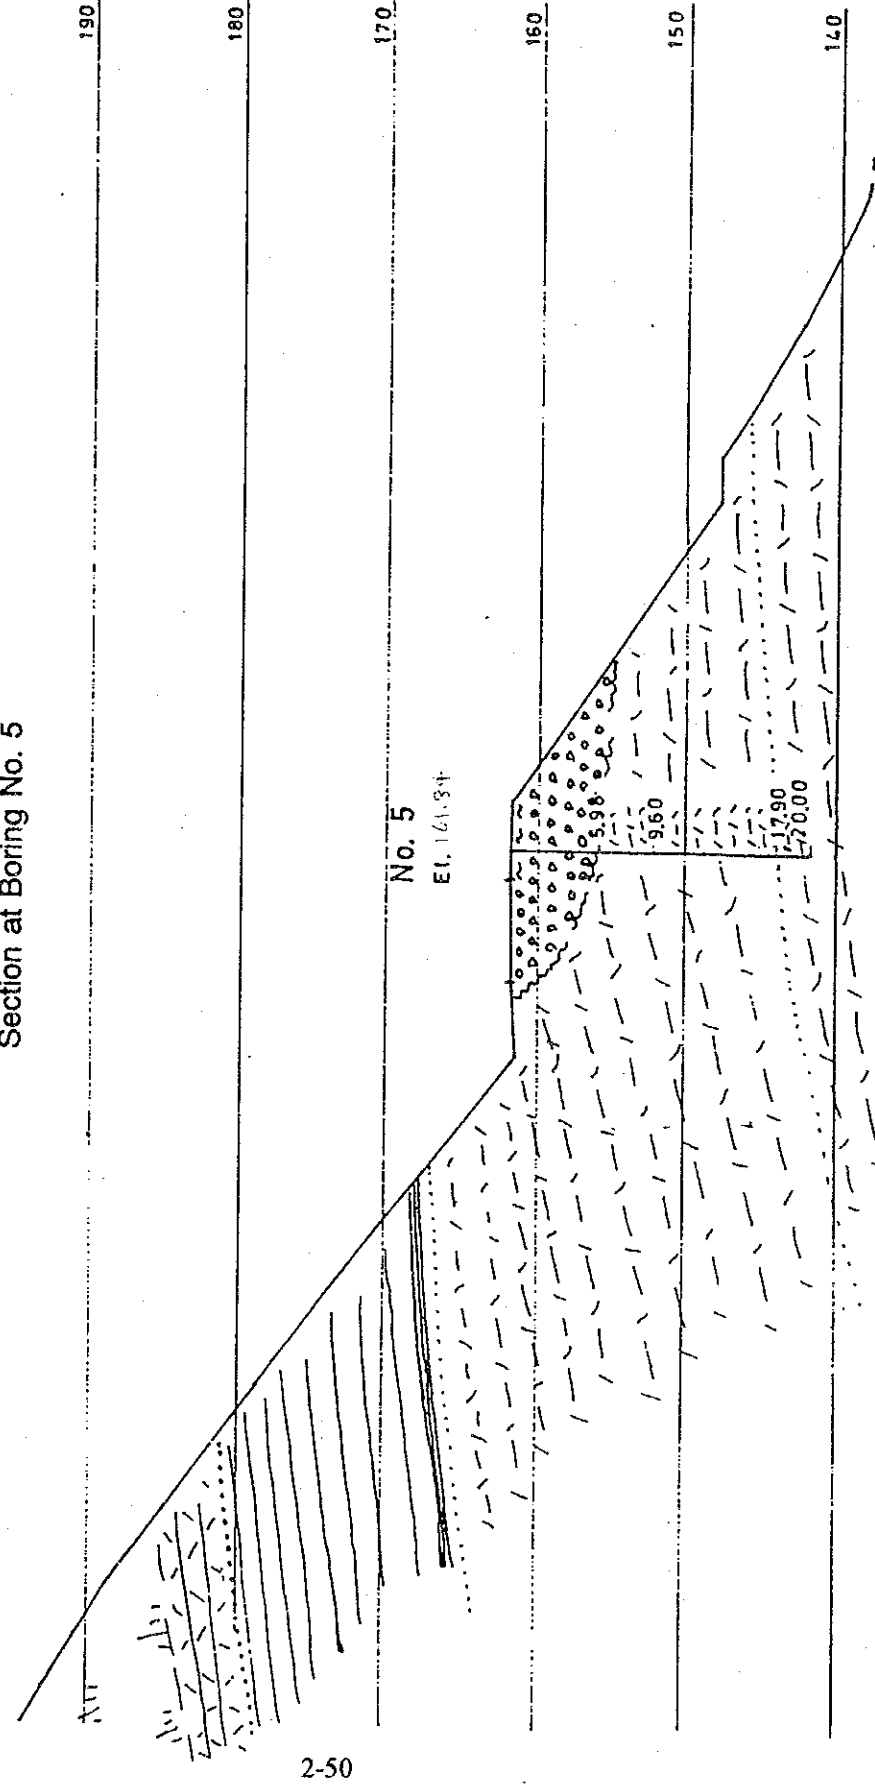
Geological Sections at the Km-166 Site on the Telica-San Isidro Road
